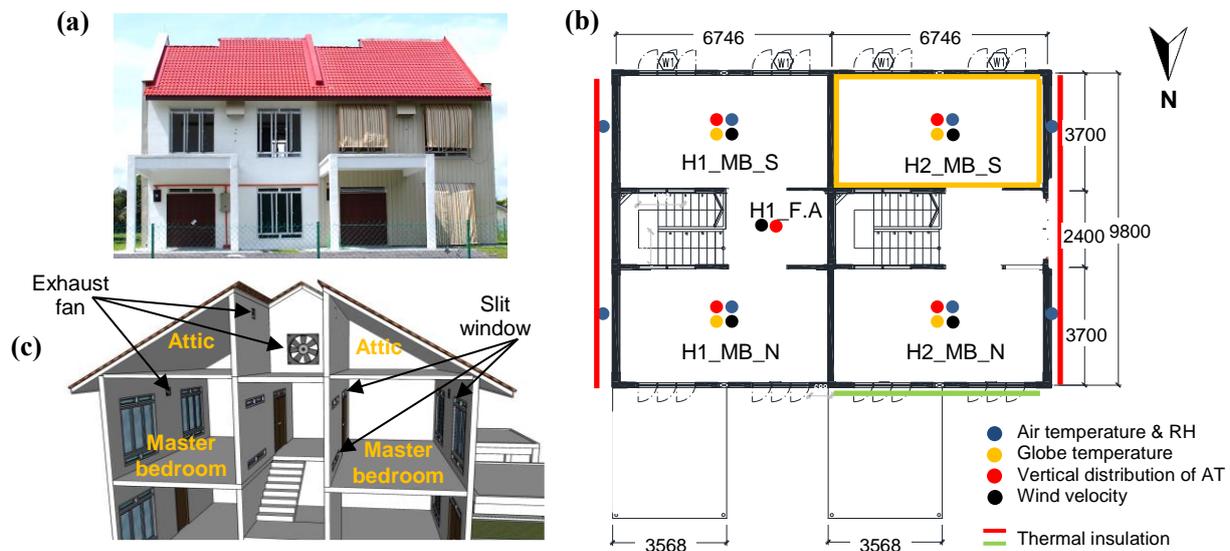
UTM experimental house. (a) Front view; (b) 1st floor plan and instrument setting; (c) additional passive cooling modifications.
